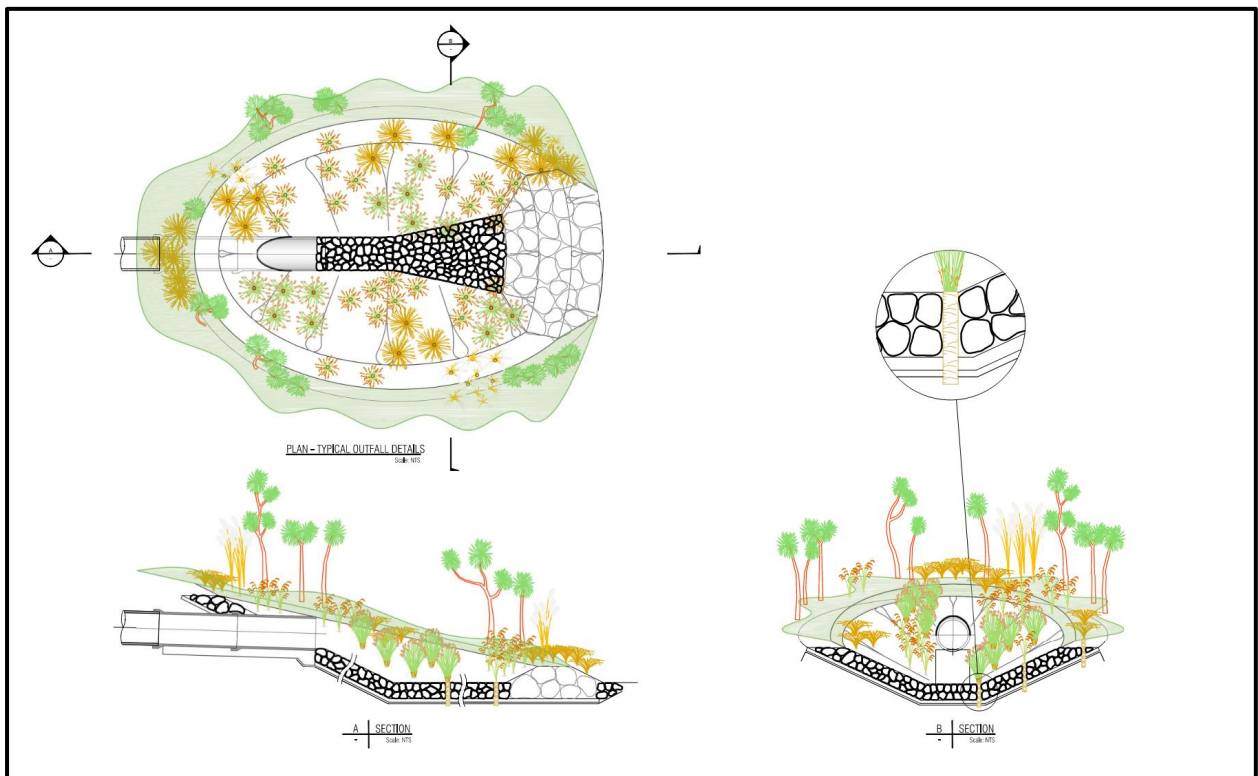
Typical Stormwater Outfall Design (Source: Stormwater Effects Assessment)
